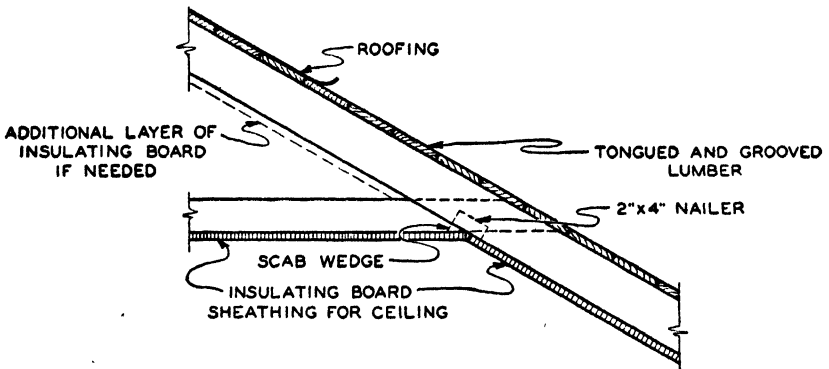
Pitched Roof with Insulating Board Applied to Both Flat and Pitched Portions of Ceiling; also Showing How Additional Layer of Insulating Board Can Be Applied to Under Side of Rafter.
